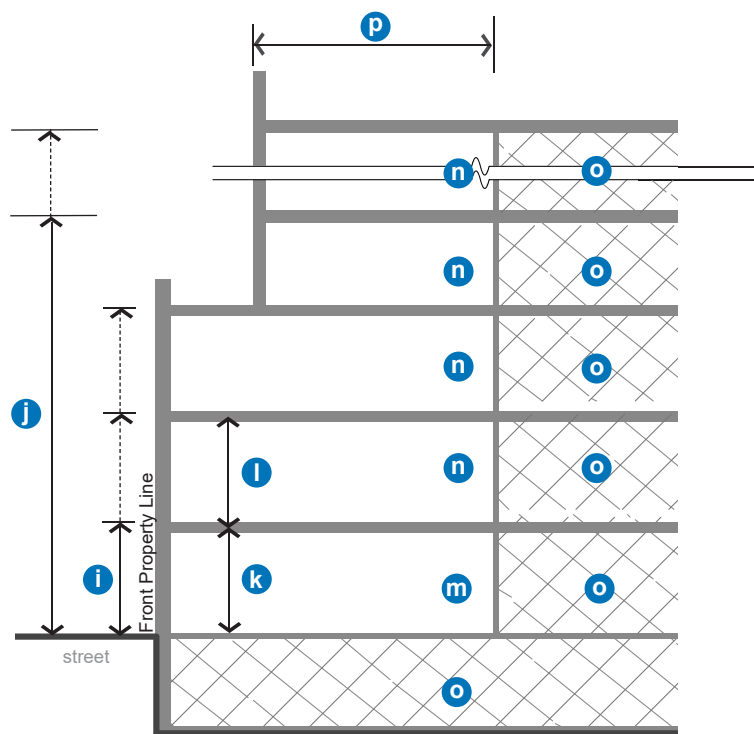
(2) Storefront Building: Height and Use Requirements
